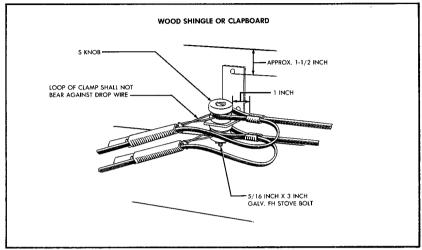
First Attachment, House Bracket (Drop Wire Run in Horizontal Direction On Building)
